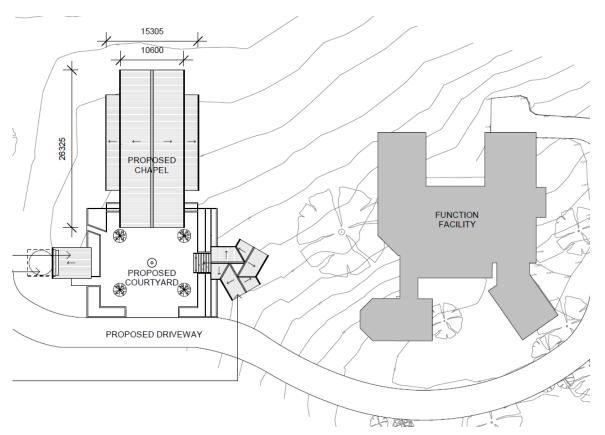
Site Plan Illustrating Proposed New Chapel Building
